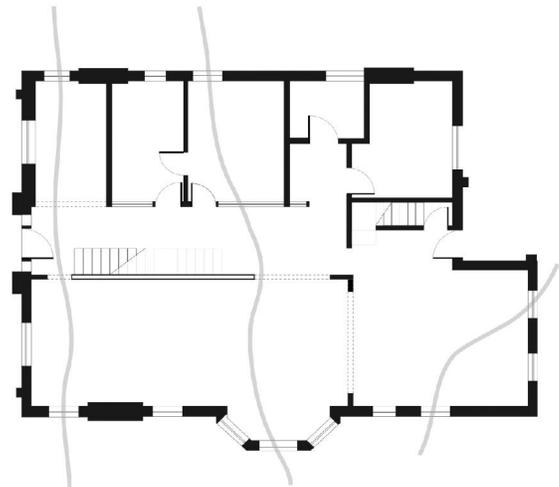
1251 Bryden Road House Plan, Columbus, Ohio
